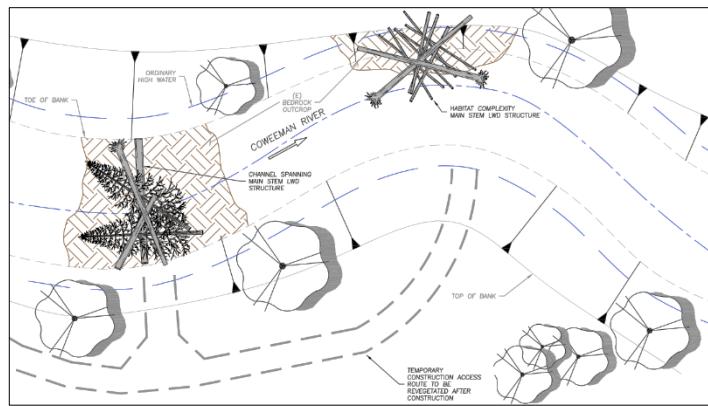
Drawing from design plans Sheet C12 illustrating typical Ceweeman River LWD structure types.
